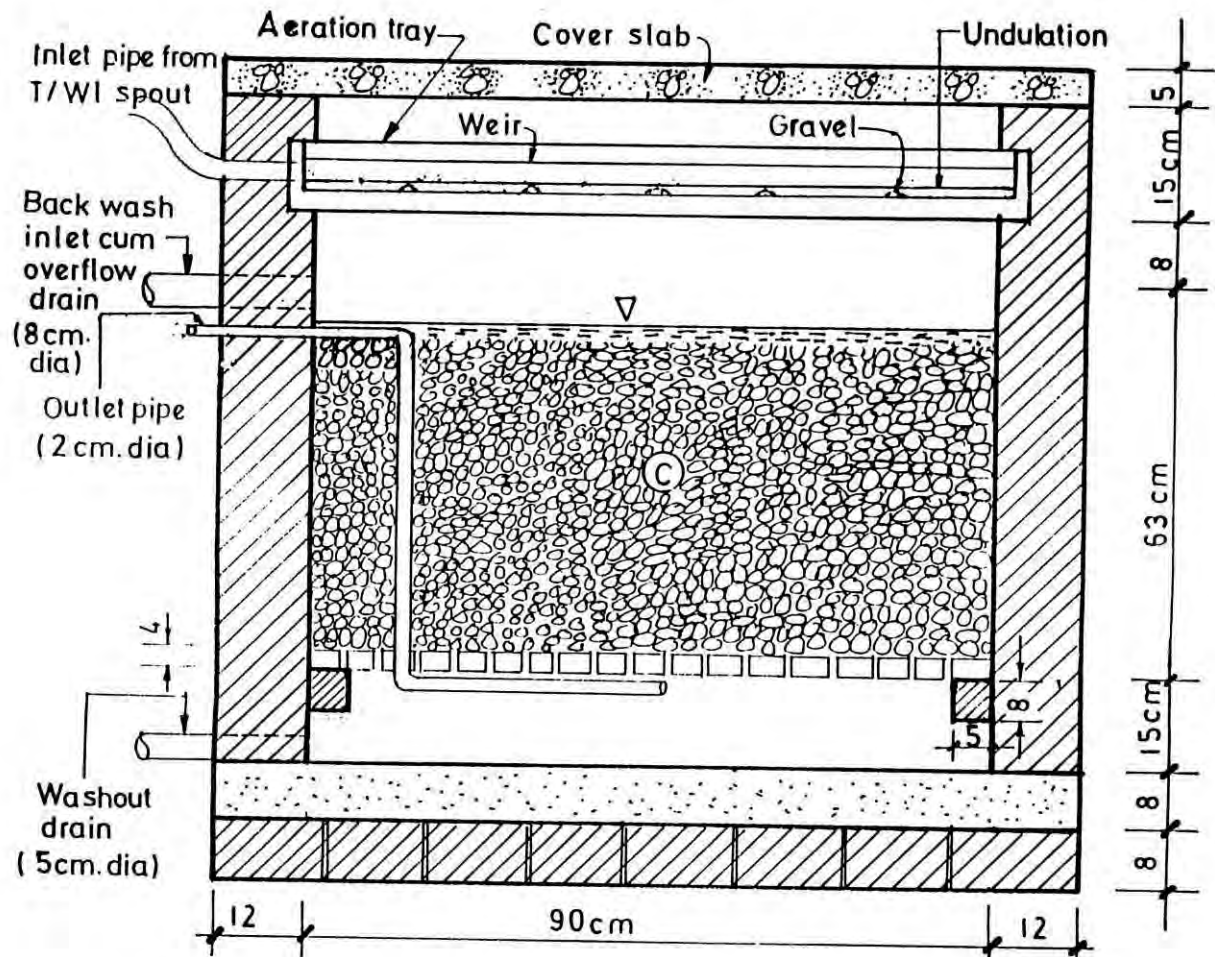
TRANSVERSE SECTION Y-Y OF THE PLANT
